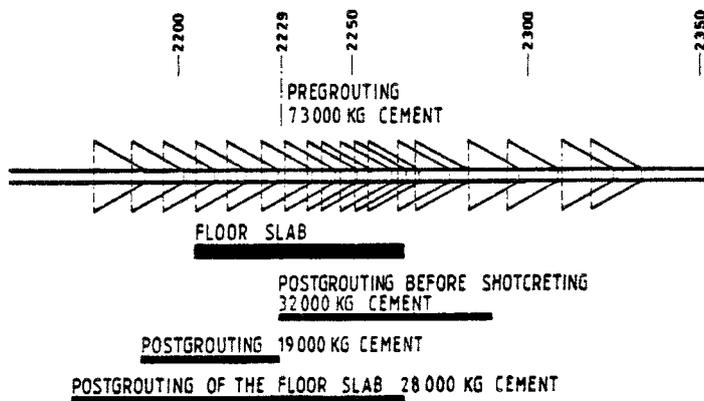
Sea Sewer. Grouted area and number of pregrouting rings.
